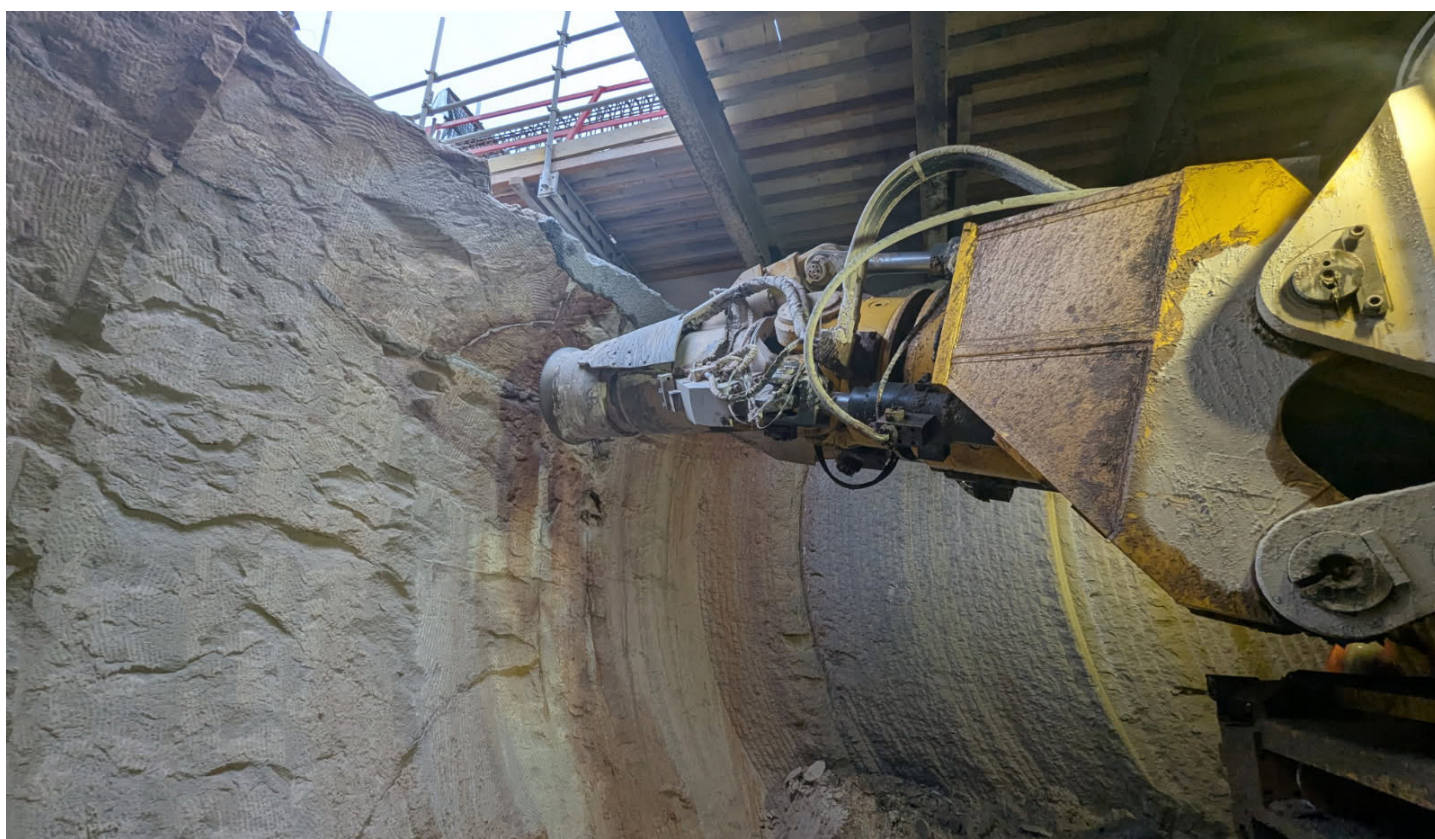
A hard rock continuous miner was used to create the new underpass structure, excavating around 3000 cubic metres of sandstone and rock.
